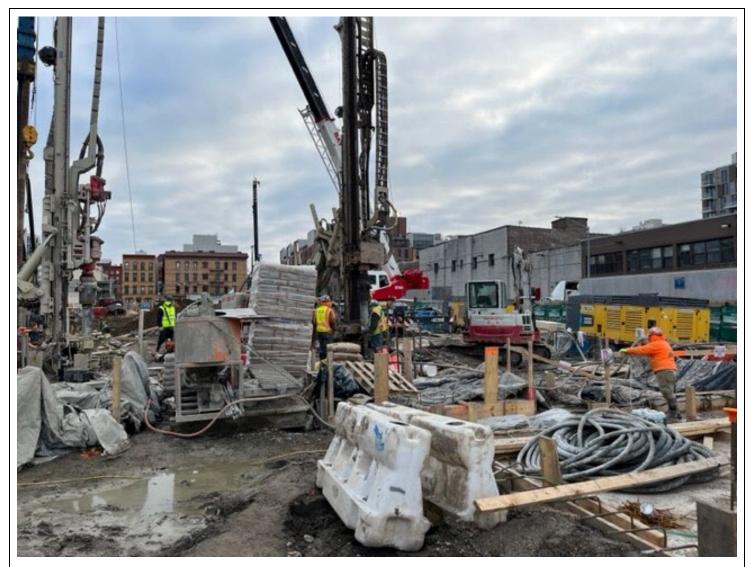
View facing south, CCJV pouring concrete into foundation footing located in grid cell SC-9.
